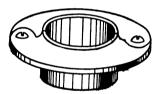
Floor-Plate Adjusted to Plain Sleeve for Carrying Pipe through Floor or Partition.
